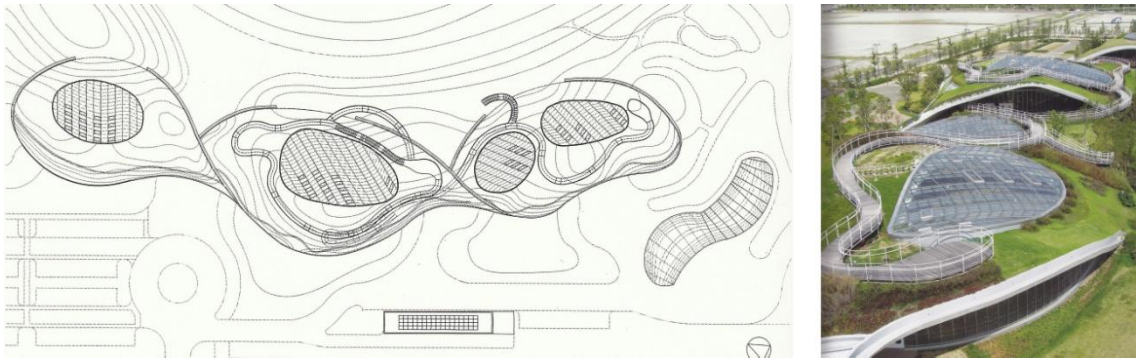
58. Concrete shells, Island City Central Park, Fukuoka, Japan, Toyo Ito
